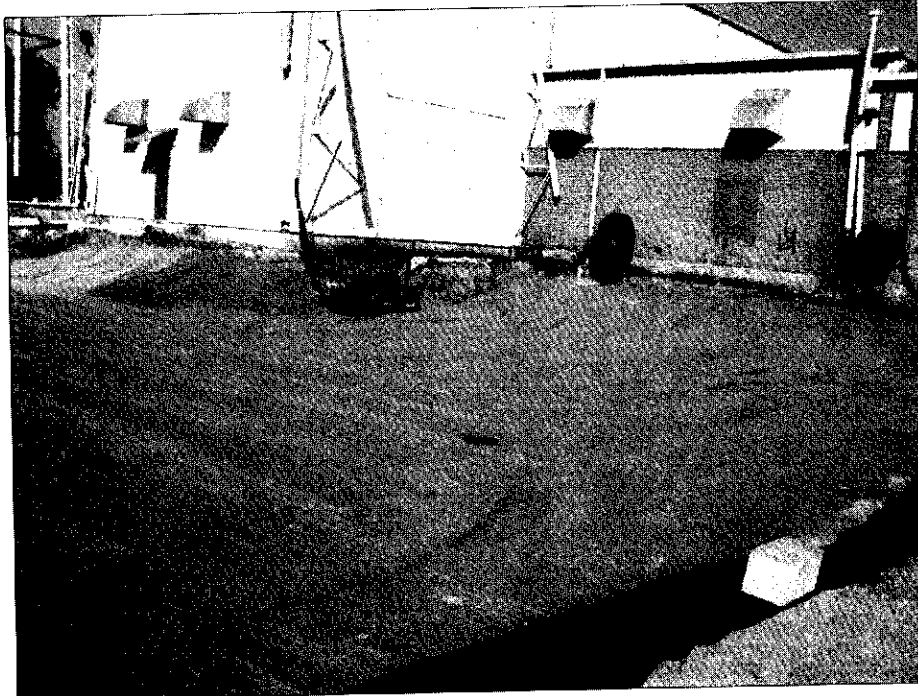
COMPLETED EXCAVATION WITH FIRST LIFT OF BACKFILL
